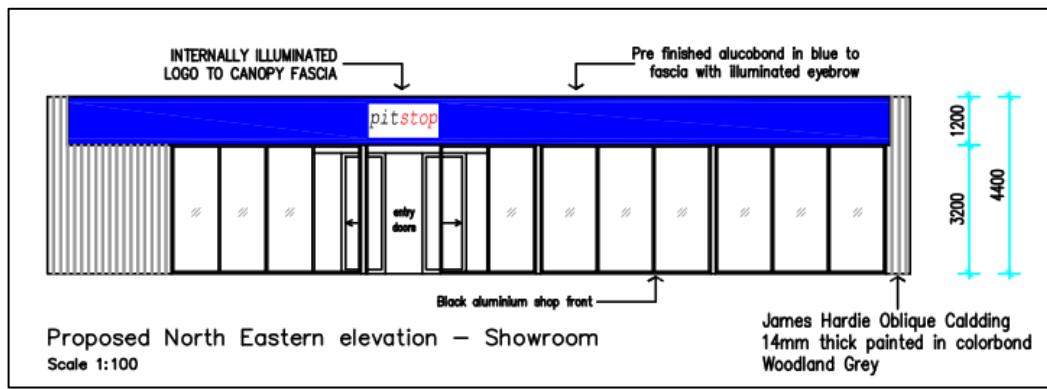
North-eastern elevation of sales building (Source: Badaoui Group, 2025)
